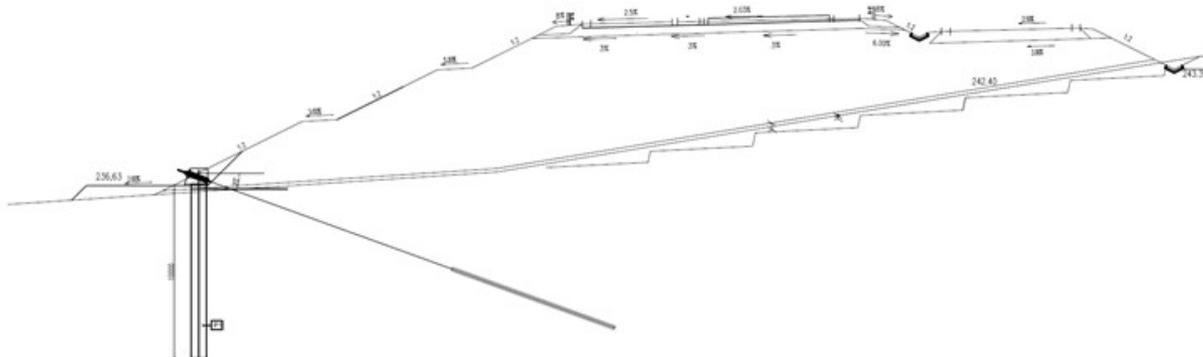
Embankment remediation by anchored pile wall at landslide toe
